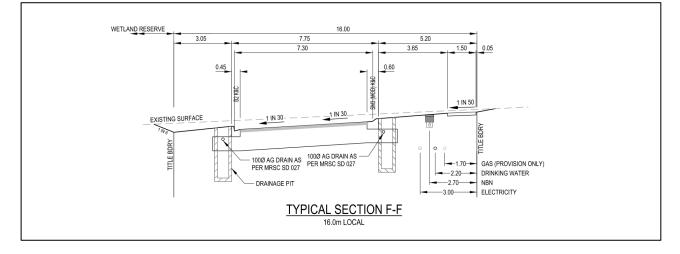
Local Access Street - Open Space Interface / Townhouse Cross Section - Opt 2 (16m)
